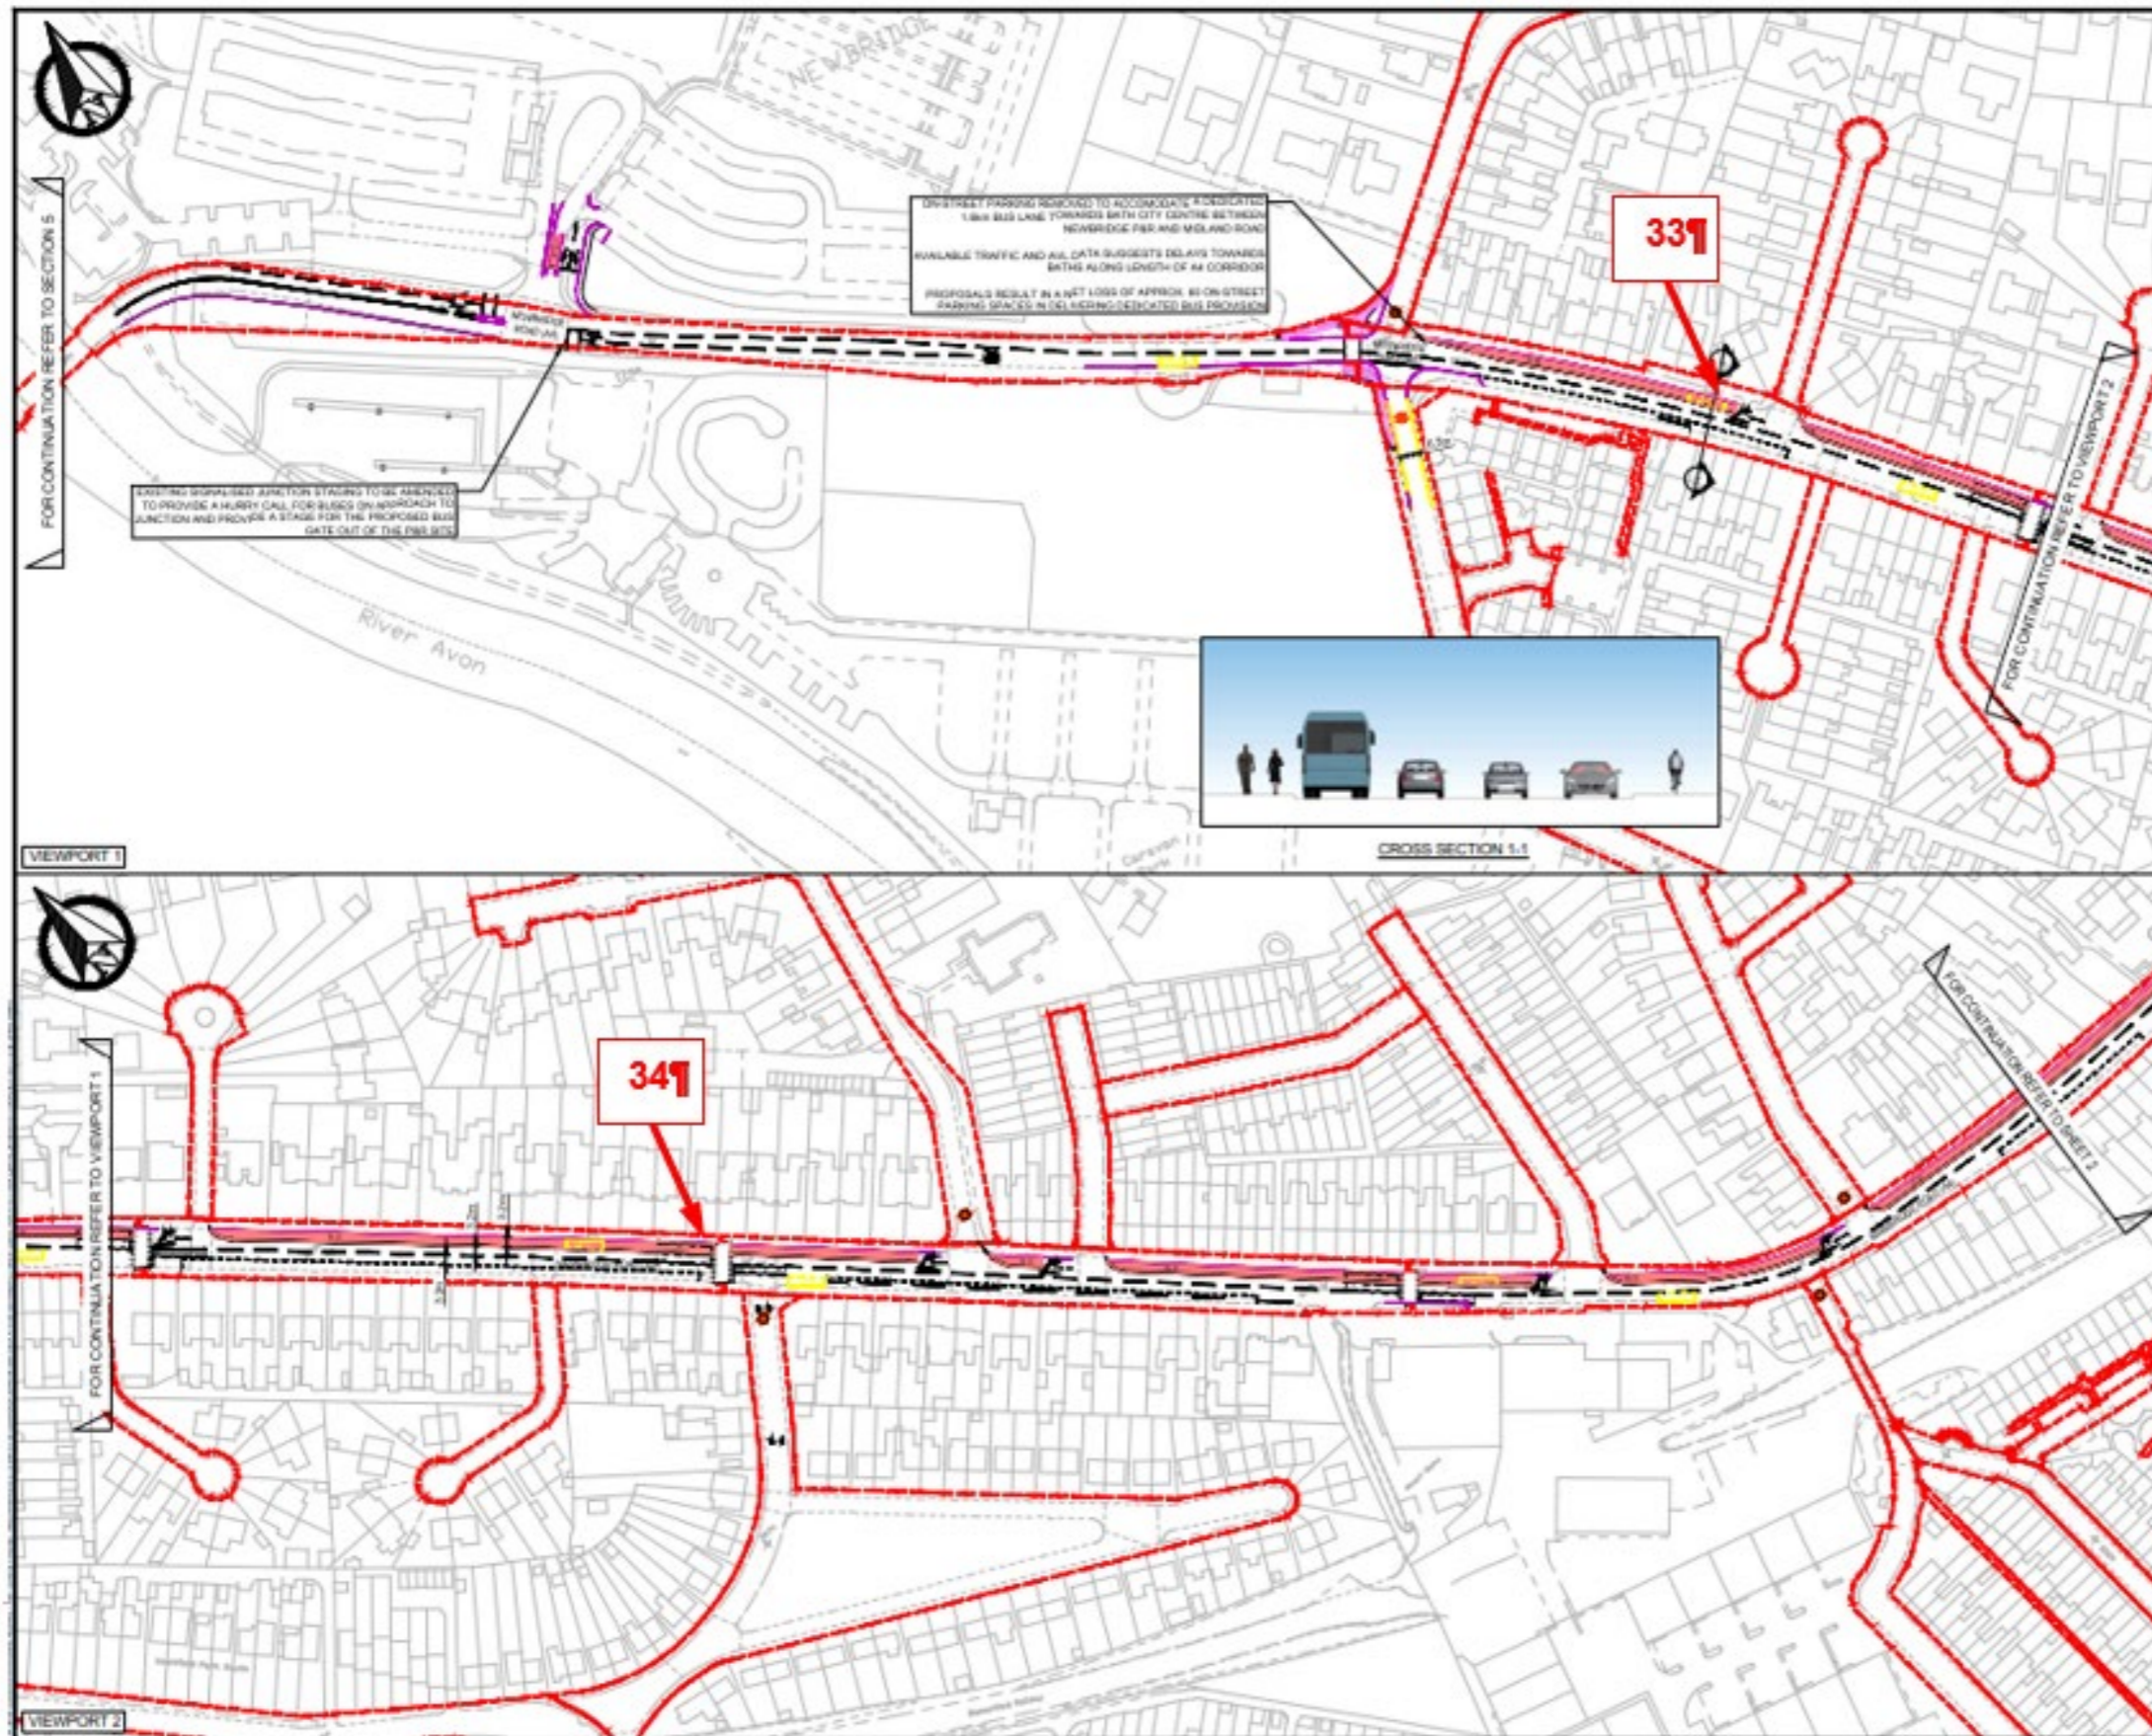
Community Connections Area 1 Road Safety Audit Problem Location Plan
